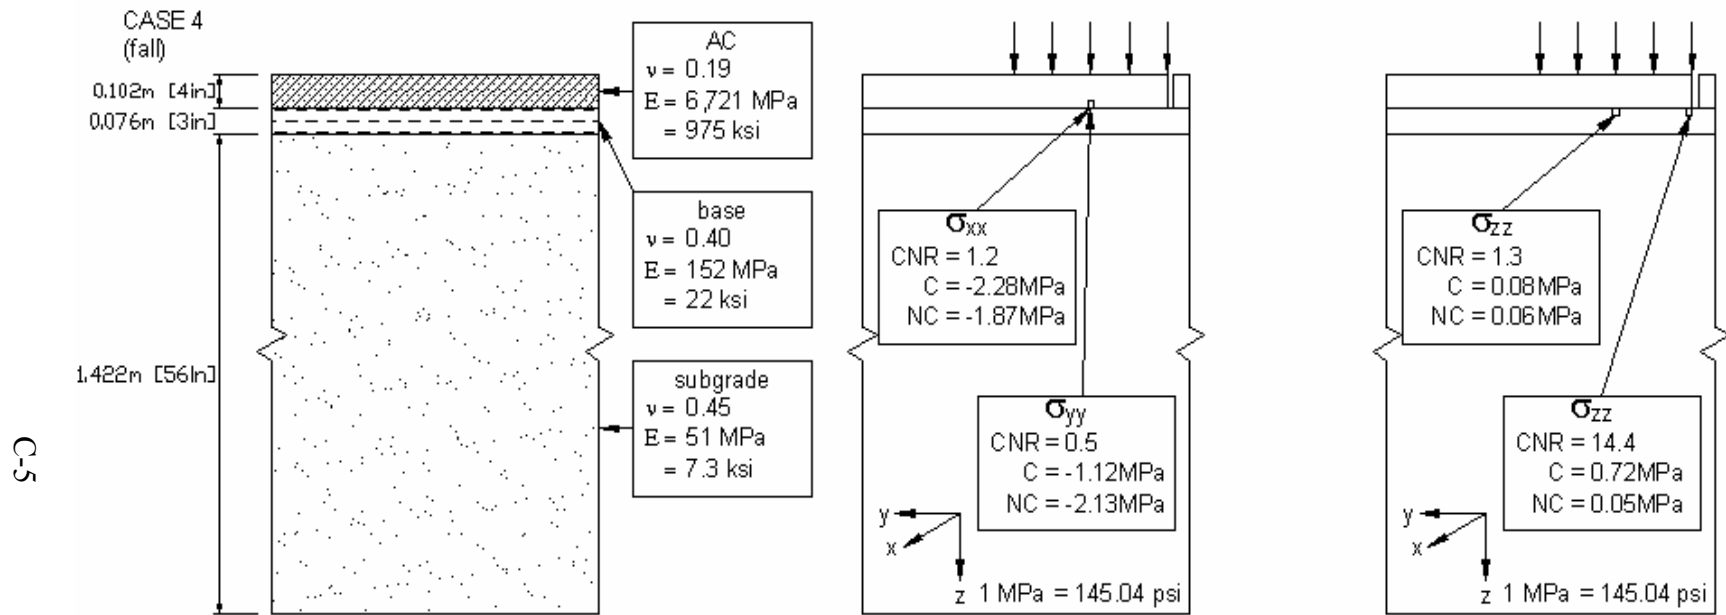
Summary cross section for case 4, (C – stress in cracked pavement, NC – stress in pavement with no crack, CNR – crack/no crack (stress) ratio)
